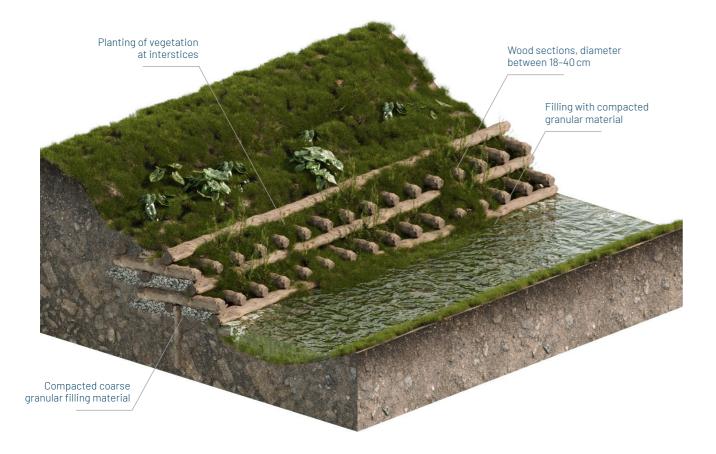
Wooden cribwall (Source: Guajava. Adapted from Helgard, Z., 2007).
